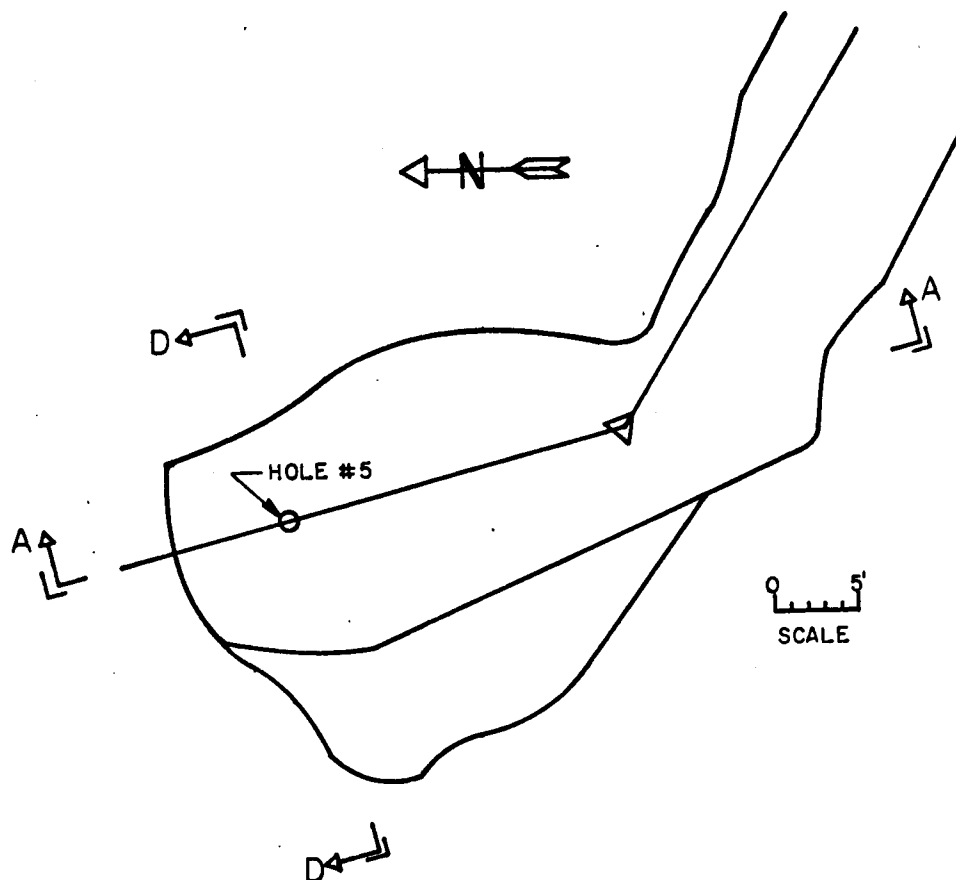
Plan View of Hole No. 5 Mineback Showing Locations of Vertical Sections.
